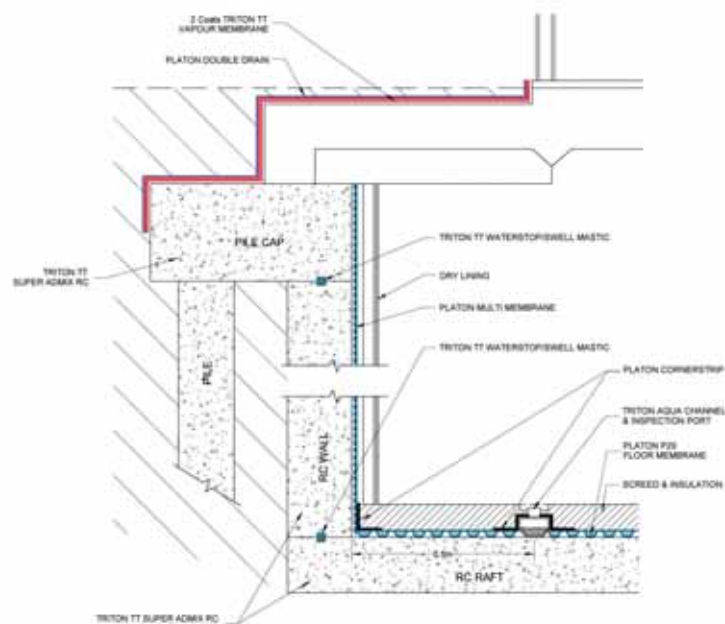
below: Goldsmiths, UCL – typical wall section detail.
